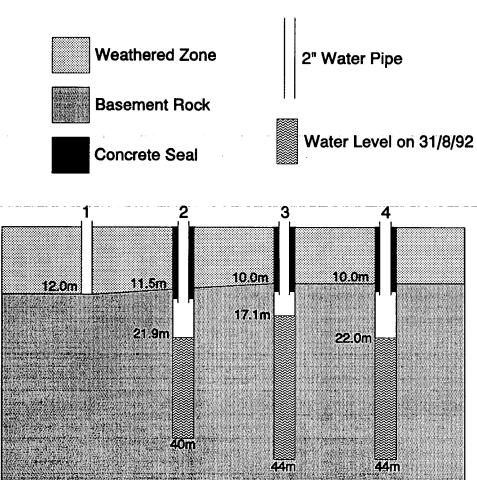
Location and Construction Details for the Observation Holes Drilled at Maramba School
